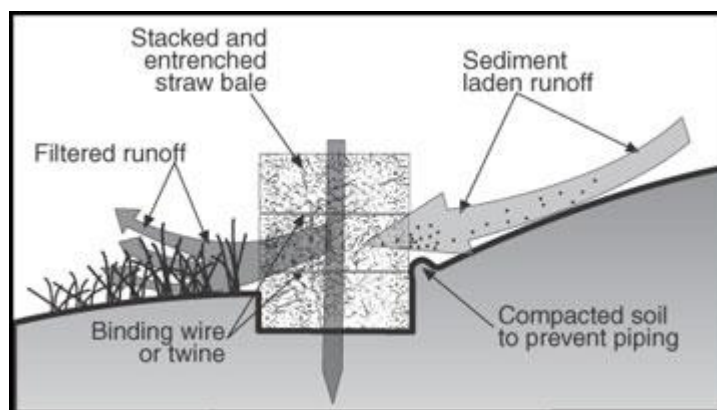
Cross-section of installed hay bale check dam indicating staking and excavation of bales into the soil.
